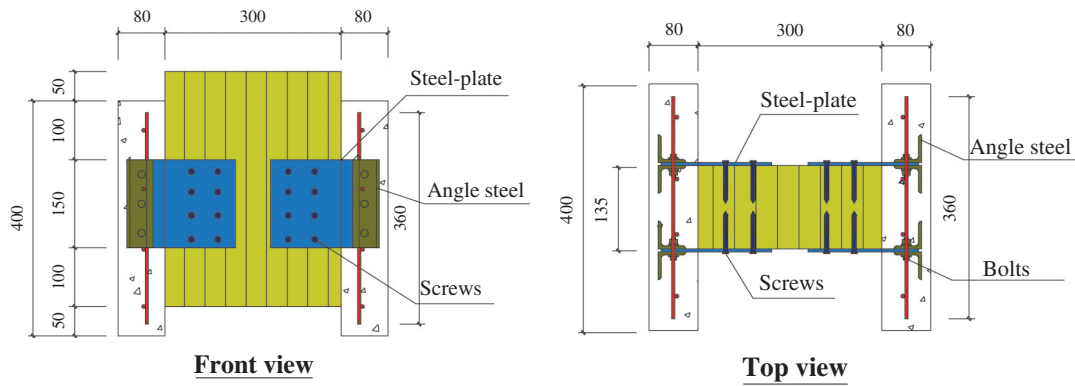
Dimensions of a SP + 8S(R) specimen (unit: mm)
